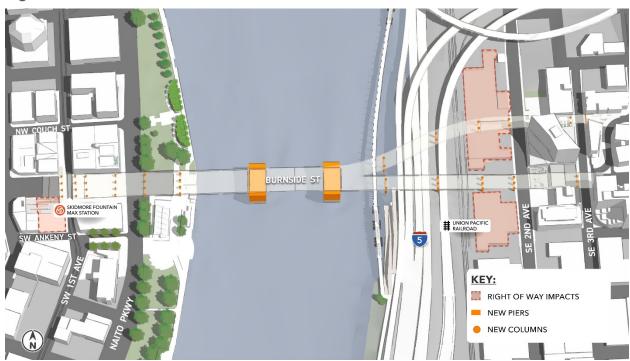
Couch Extension Alternative – Pier and Bent Locations
